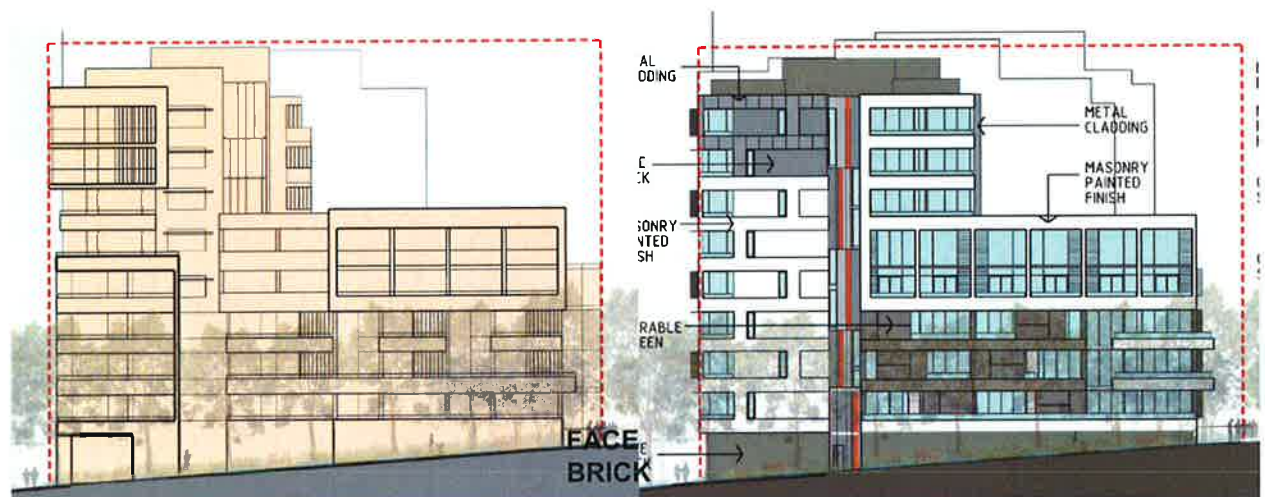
Western elevation of Building H / the Adelaide Building – as approved (left) and proposed (right)
